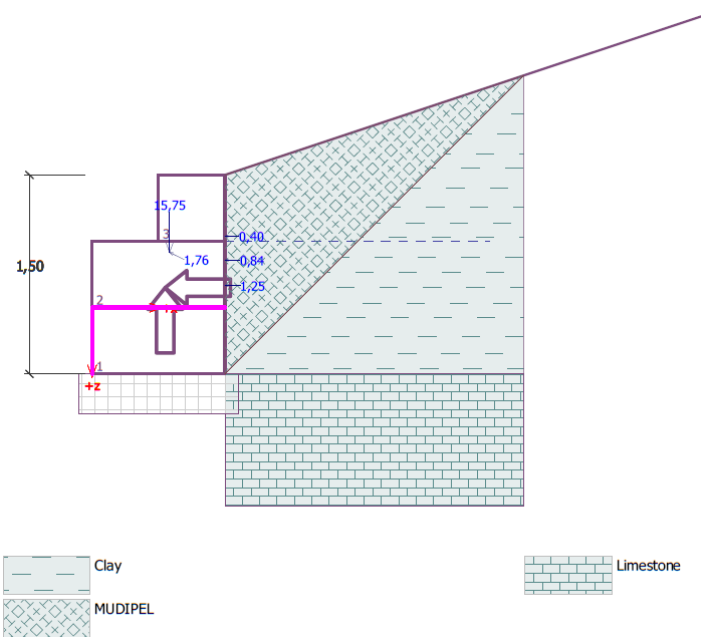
CALCULATION OF THE RETAINING WALL STABILITY
